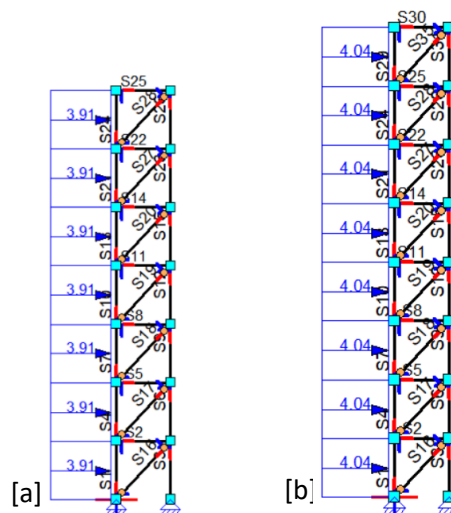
Mechanical schemes and loads for braces. Note that only the SLS forces are presented; [a] 6-storey building; [b] 7-storey building.
